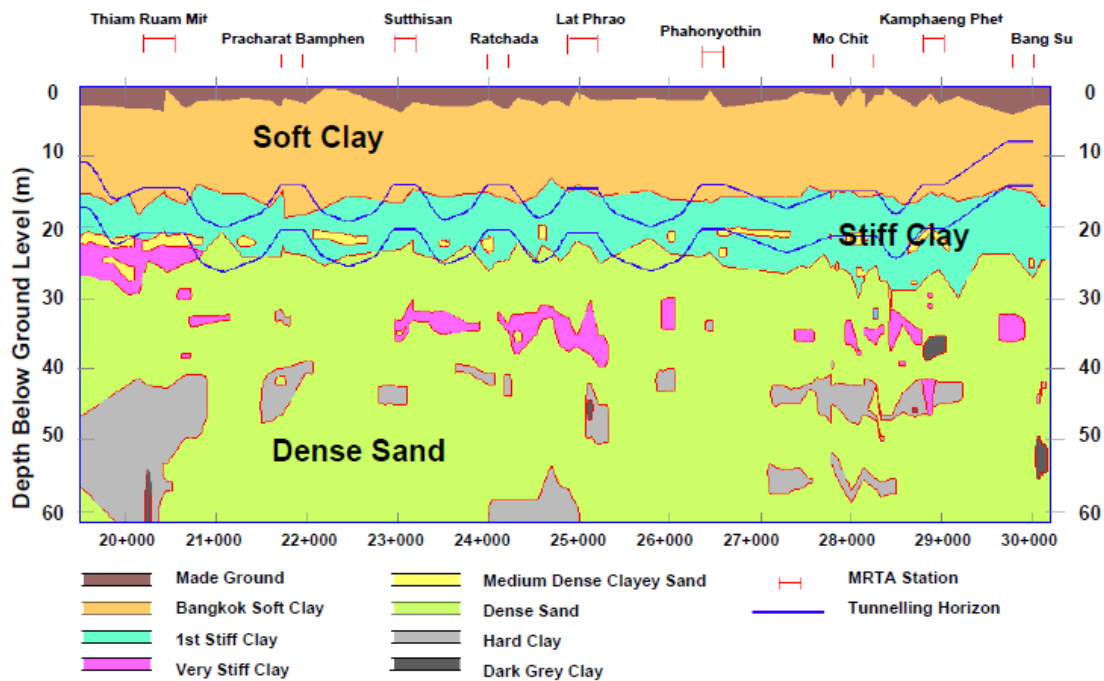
Soil Profile of Bangkok MRT Blue Line North Tunnel Section
